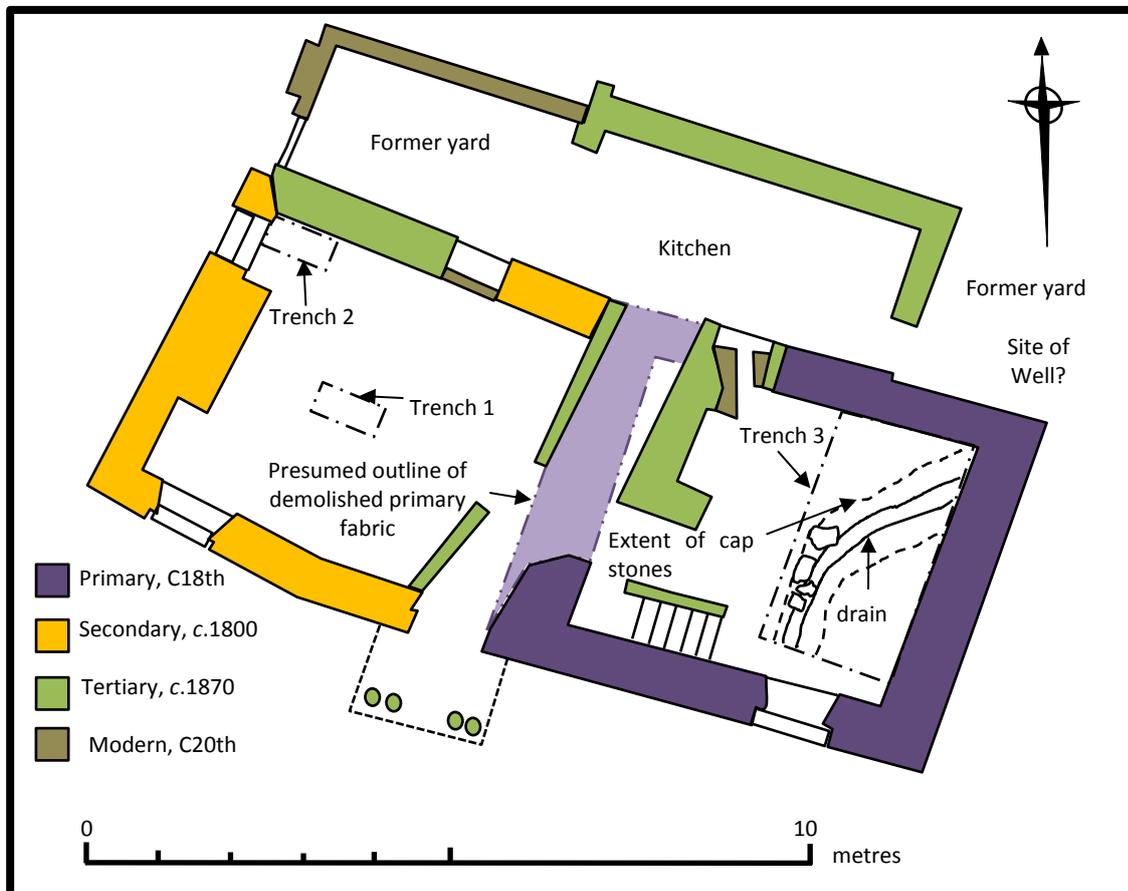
Ground-floor plan showing revised suggested phasing and trench locations.
